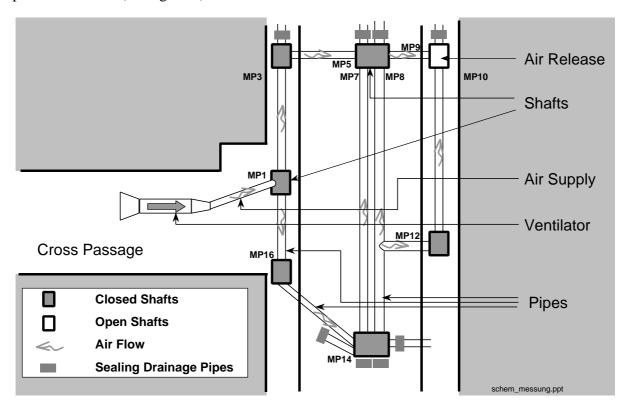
Drainage venting experiment at the test site Mitholz, Loetschberg base tunnel, measurement points, pipe sealings
